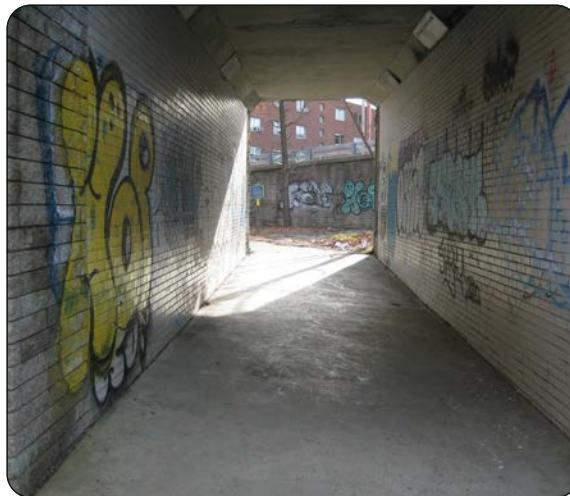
Bike path at Division Street entrance to Front Street looking west.
